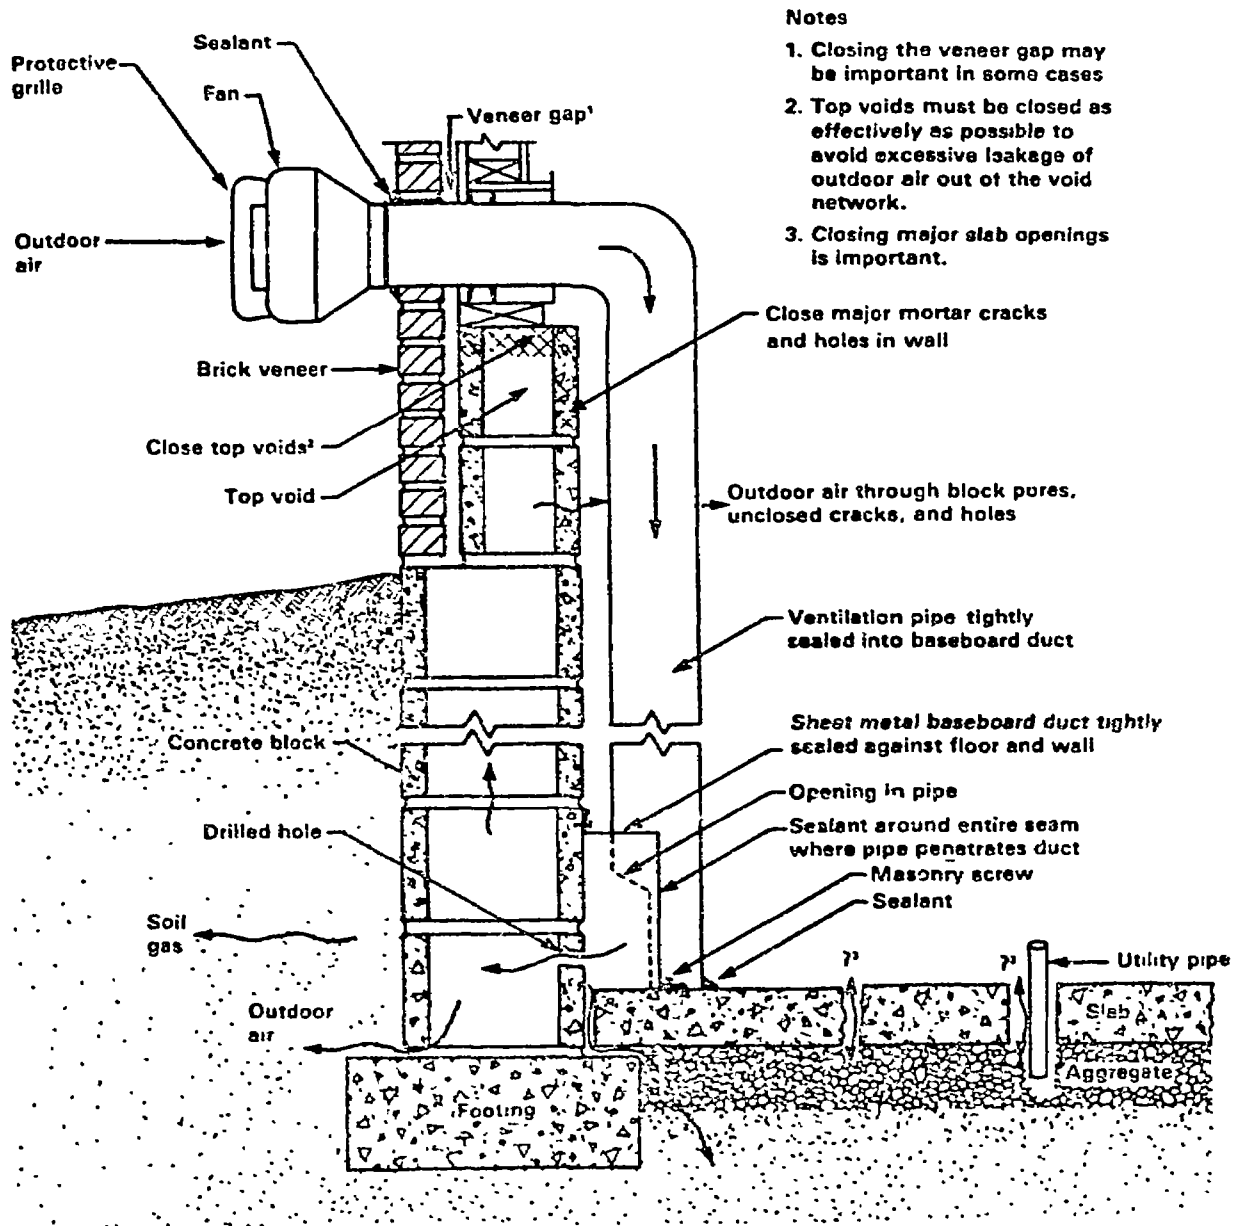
TYPICAL "BASEBOARD DUCT" INSTALLATION
